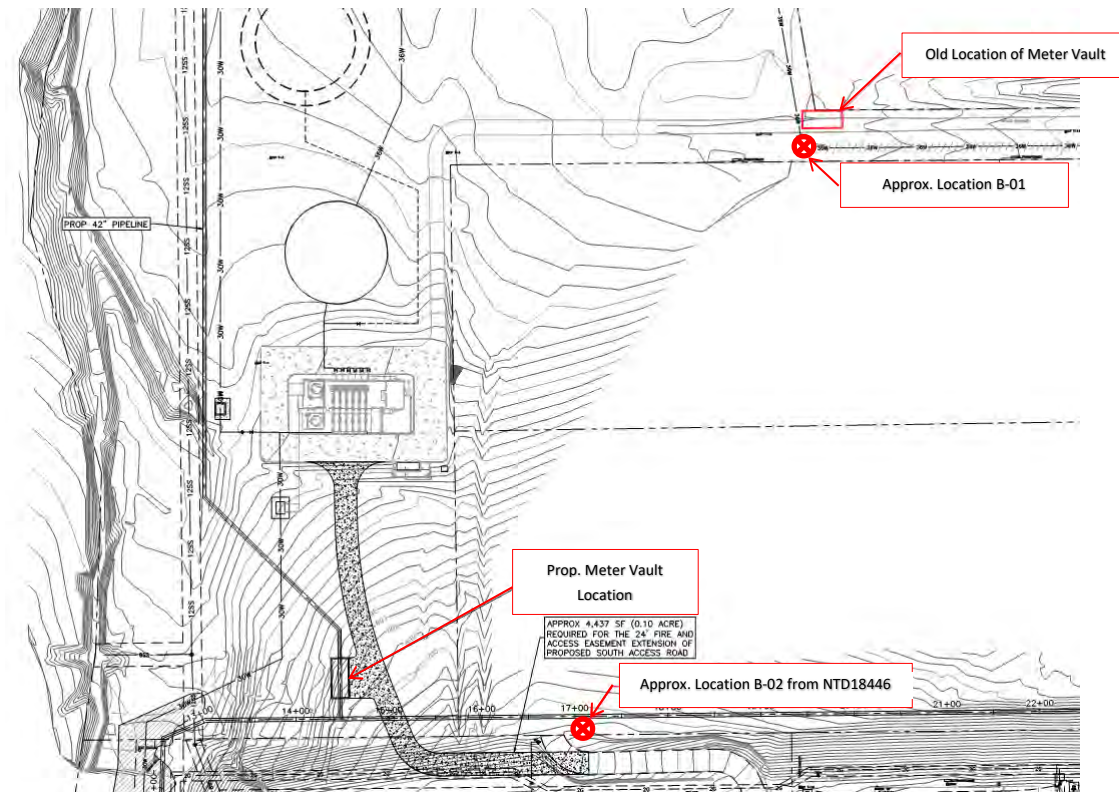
Meter Vault Relocation, Retaining Wall Location
